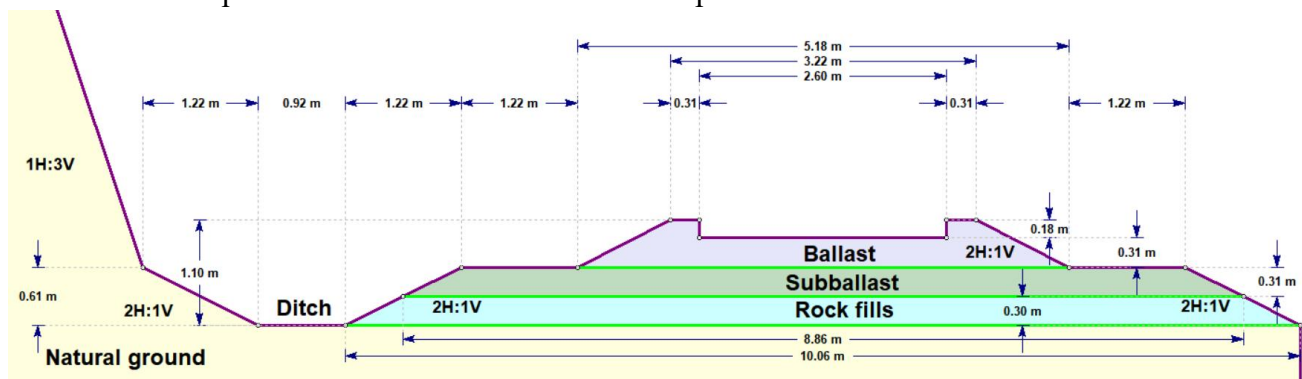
Typical cross-section of a railway embankment structure with dimensions.
